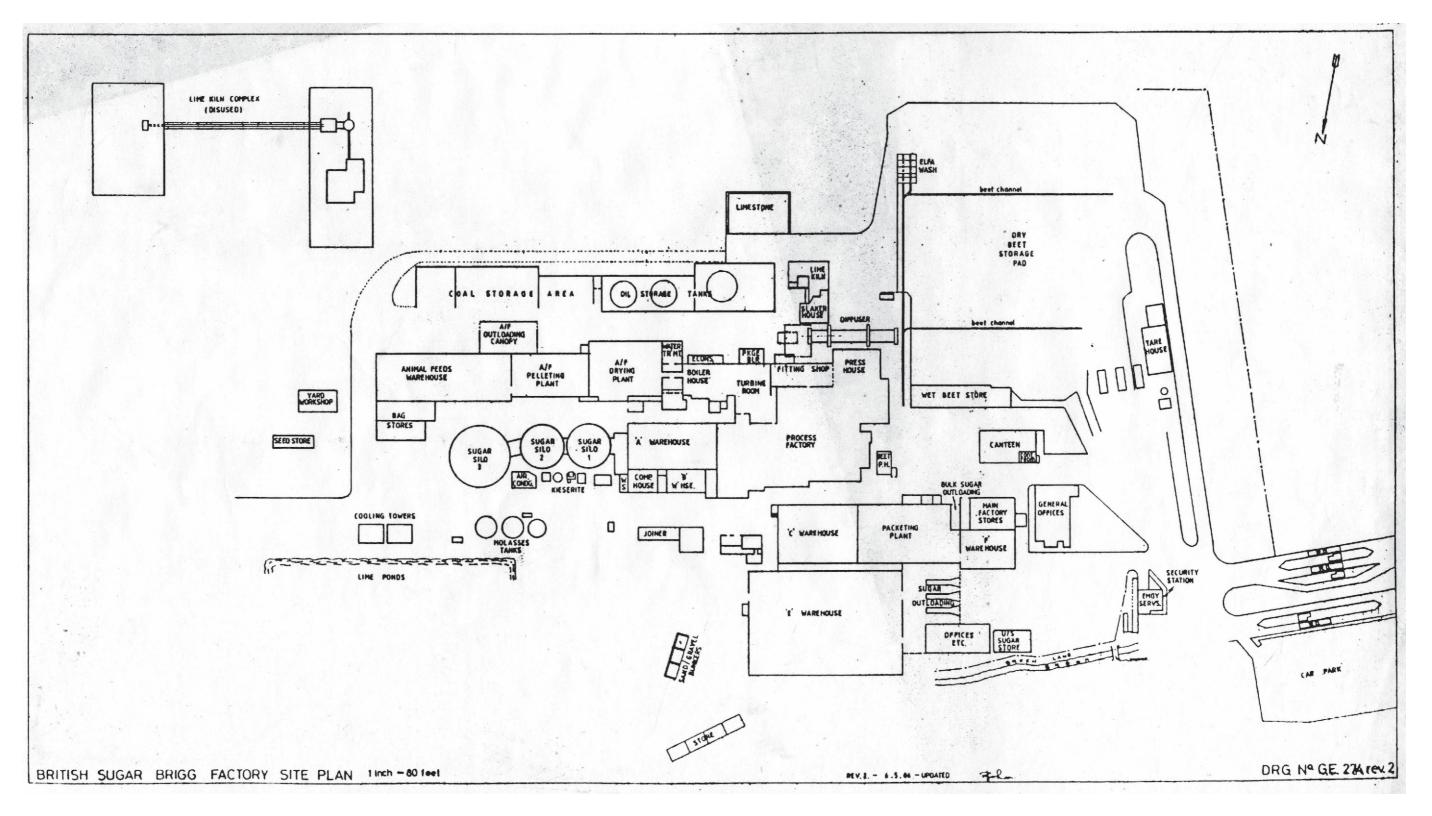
Plan recovered during the building survey showing the layout of the site in 1986 (reproduced at original scale of 1inch to 80feet)
